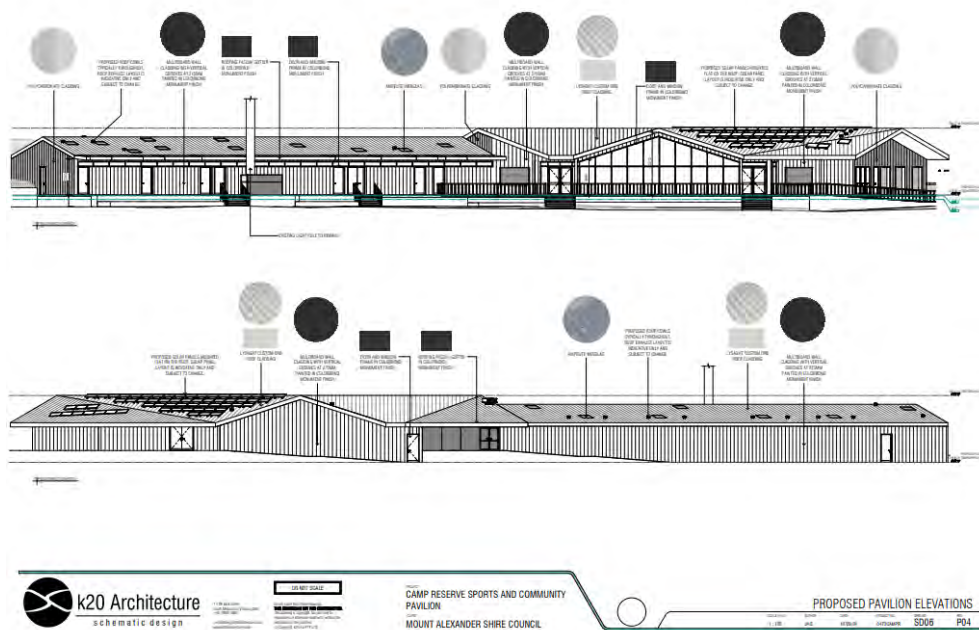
Revised east and west elevation of the pavilion. (Source: K20 Architecture)
